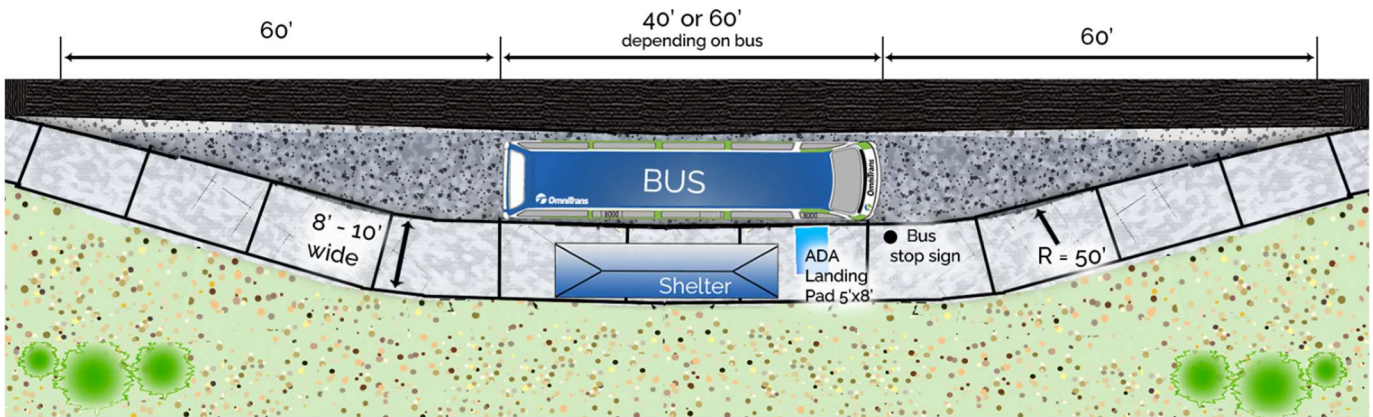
Turnout design where not immediately at an intersection (60' spacing).
